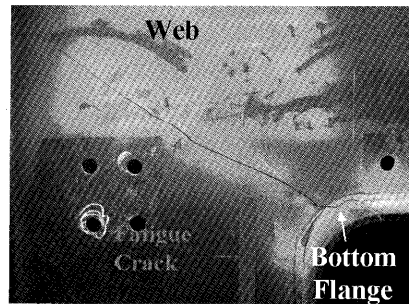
Fracture surface in the specimen without reinforcement.
